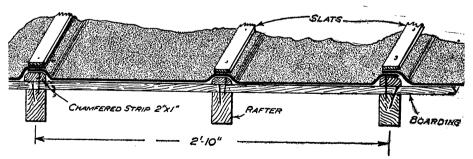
METHOD OF FIXING BITUMEN ROOFING FELT (SINGLE COVERING)
